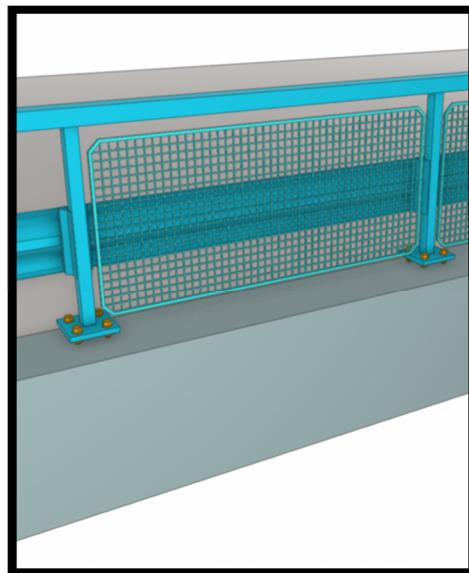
Snow proof railing panel modelled with a high level of details.
